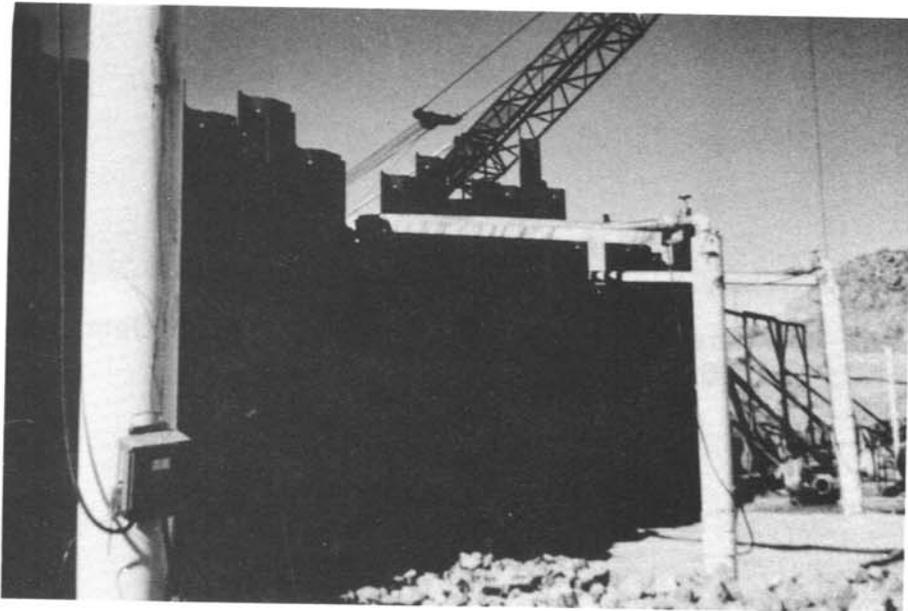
Work area showing the dewatering wells just upstream of the steel sheet piling. 7/27/89
